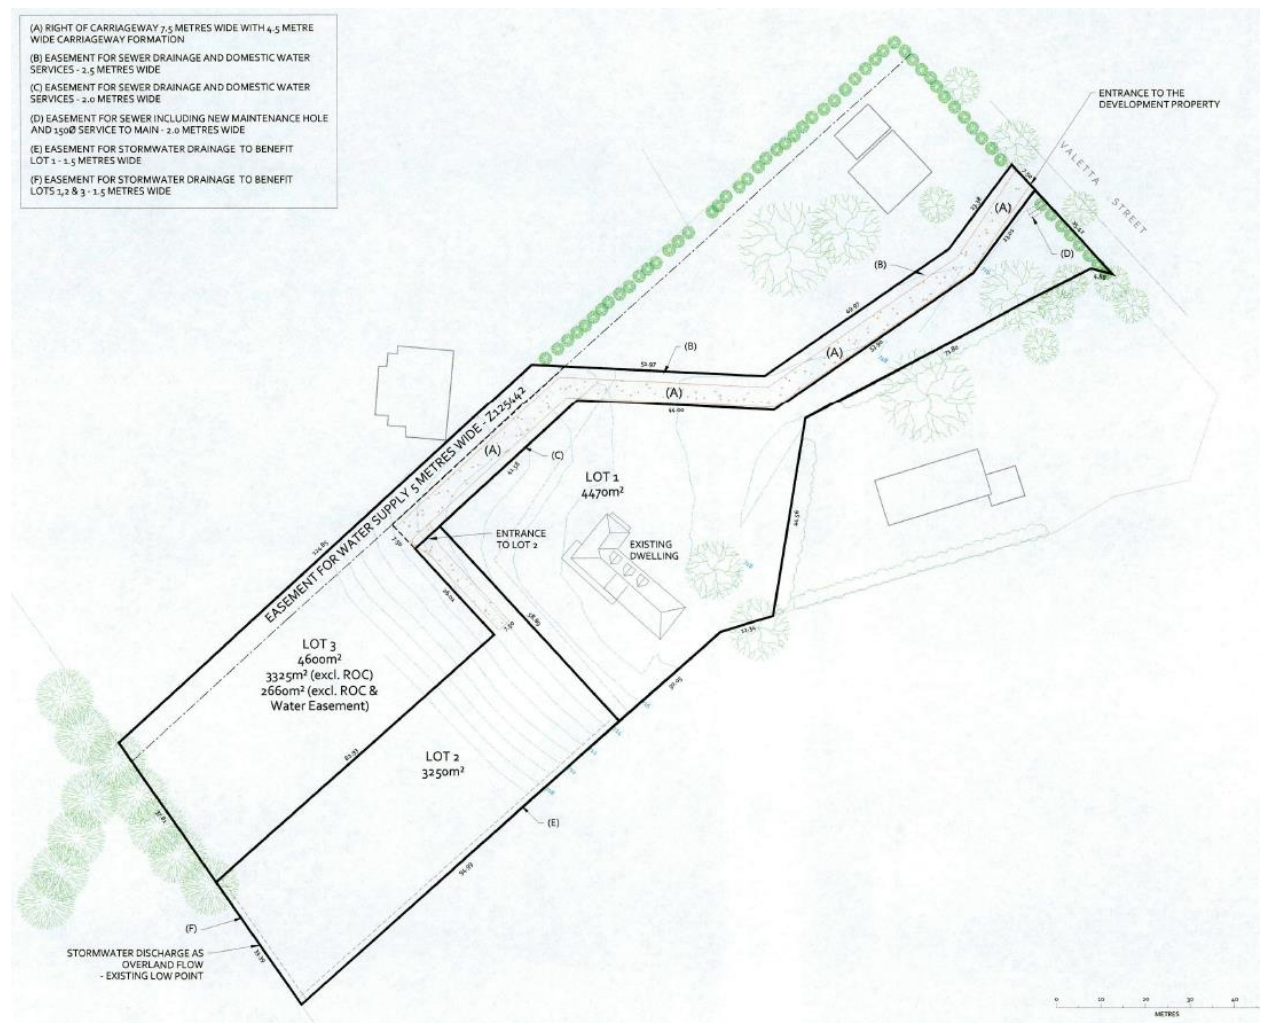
Sketch plan of proposed subdivision (reproduced as Attachment 8)
